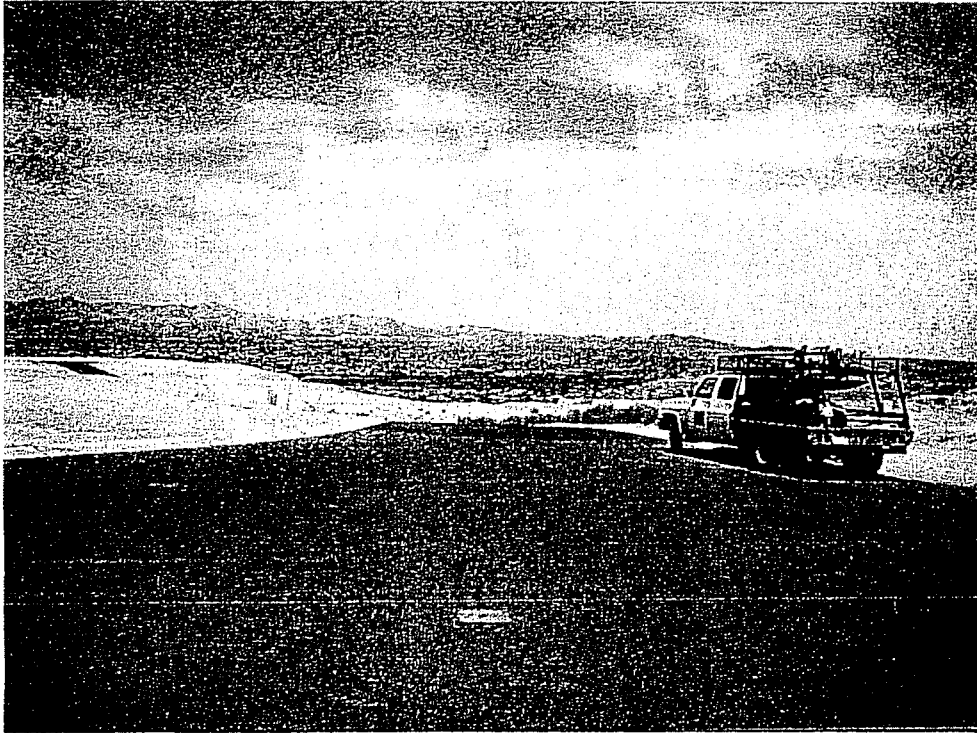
Street scene looking northwest on Eagle Ridge Drive
